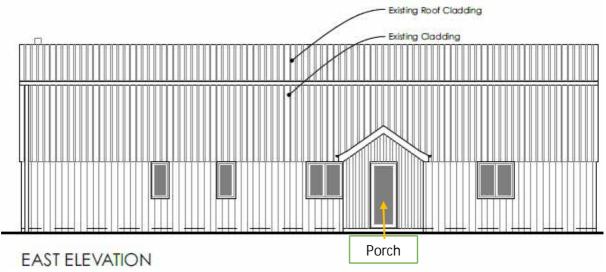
Excerpt from Proposed Planning Drawing Plans and Elevations, drawing number 21.0458 PL01 by Howes Designs
